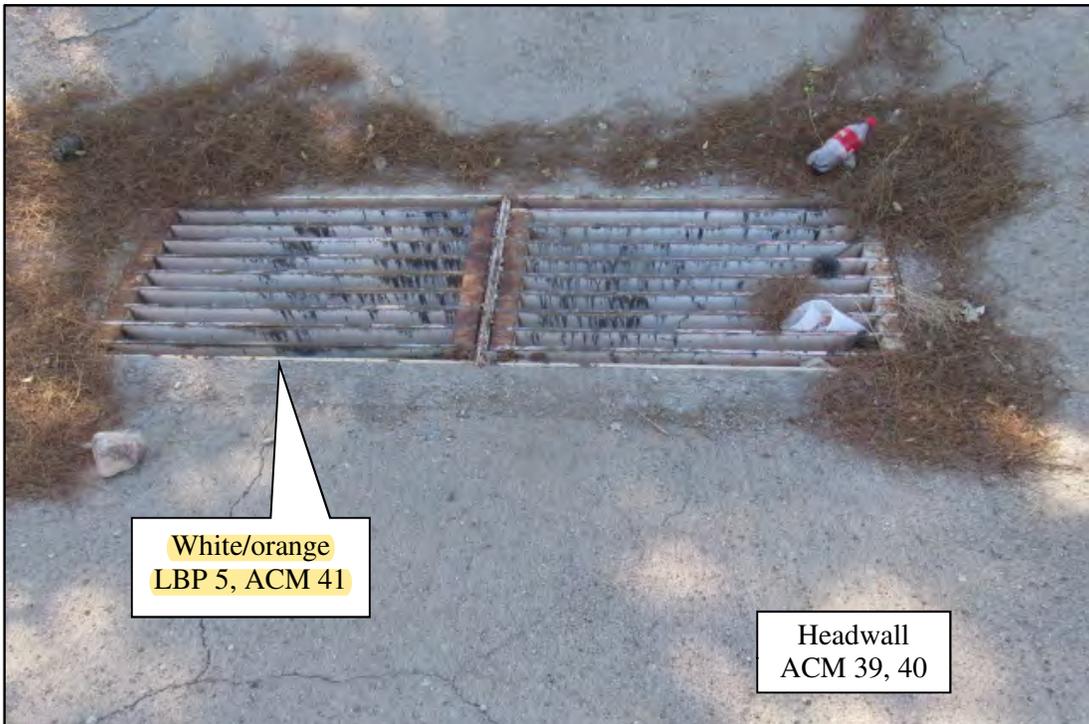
Detail view West Kingman TI OP WB off-ramp catch basin.
